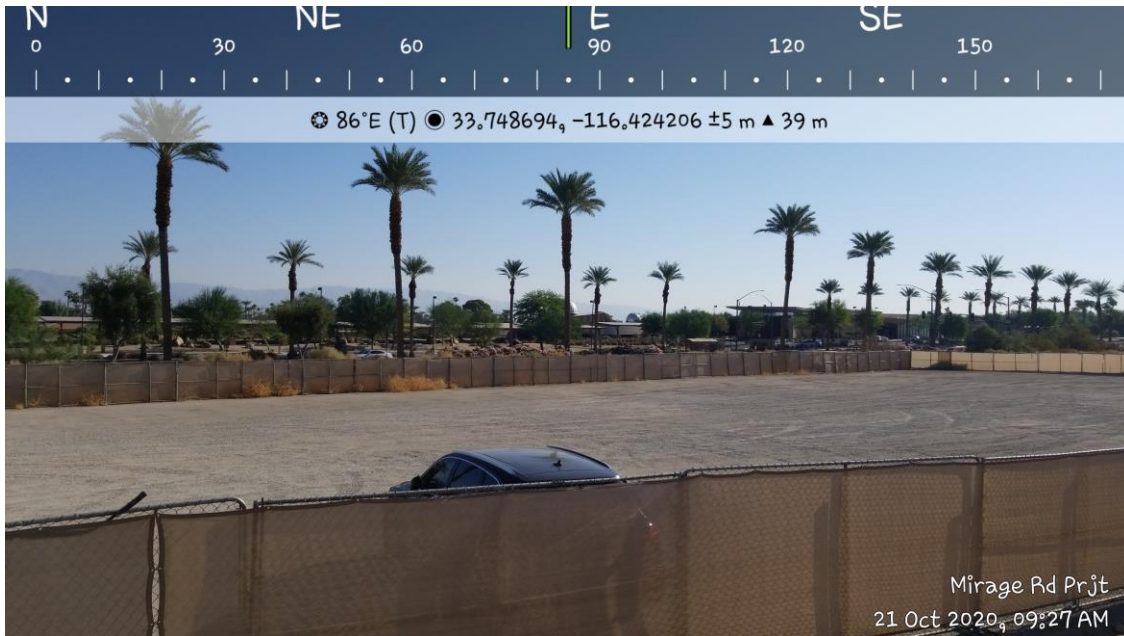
Representative condition of northwest corner of the proposed project site as seen facing east. Photo shows graded area currently being used for a parking lot.
